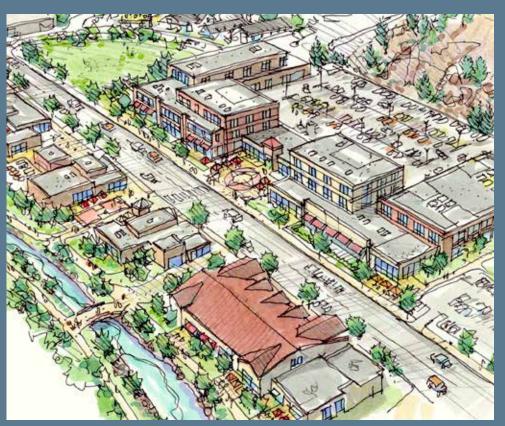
Town Hall Site Concept Plan and Rendering - Alternative 2
